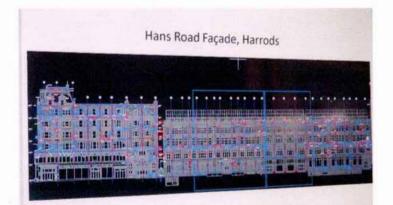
Harrods Building, Hans Road Façade, Knightsbridge, London SW3.
